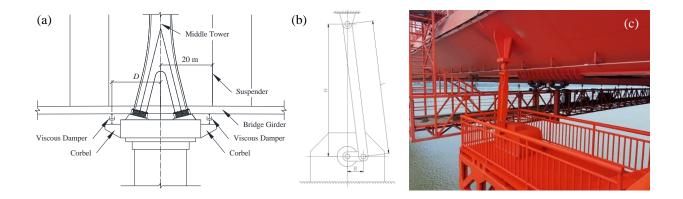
The (a) location (b) schematic and (c) photo of the girder-tower viscous damper
